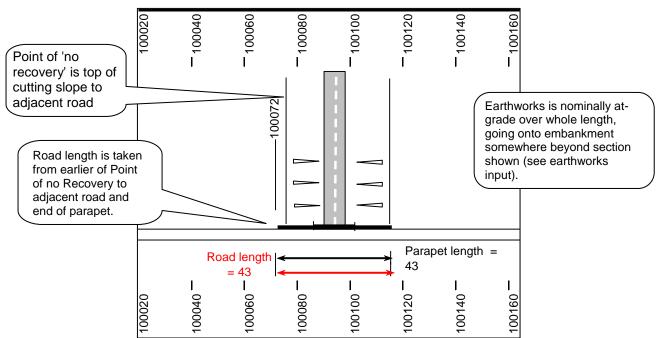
(e) Adjacent Road crossing at-grade and or at around 90° EARTHWORKS
